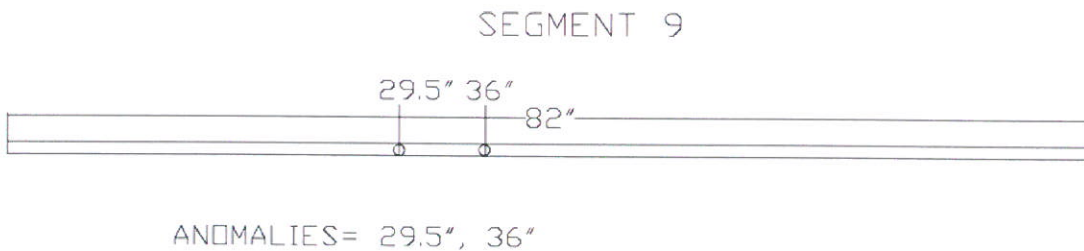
CAD schematic of Segment 9 showing anomalies on the pipe after coating removal.
